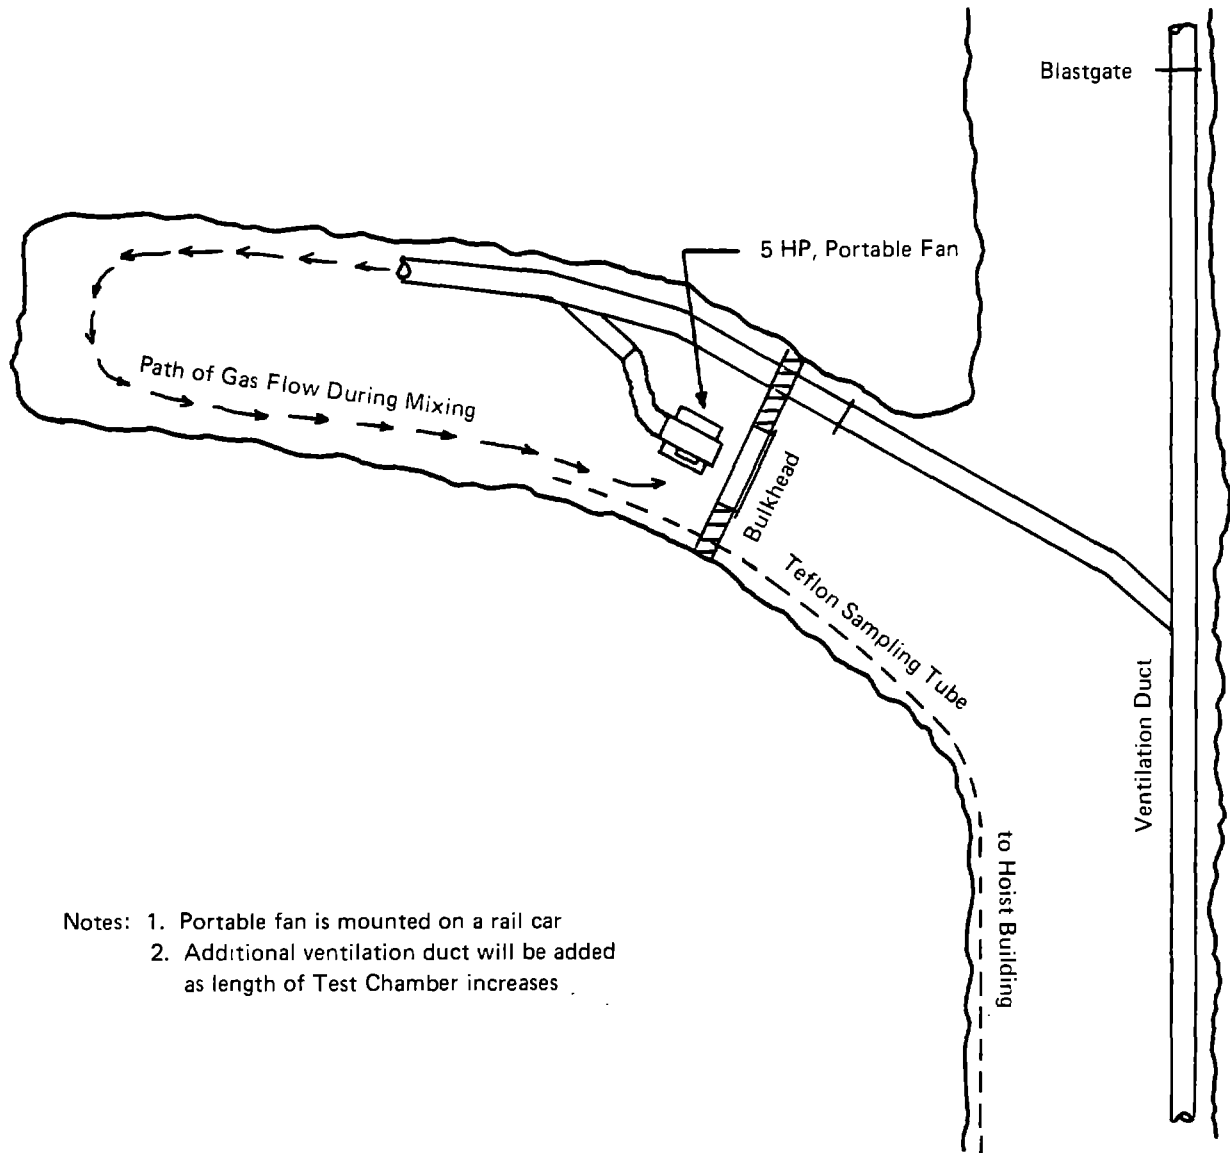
Plan View of Adit Turnout Showing Test Chamber Detail
